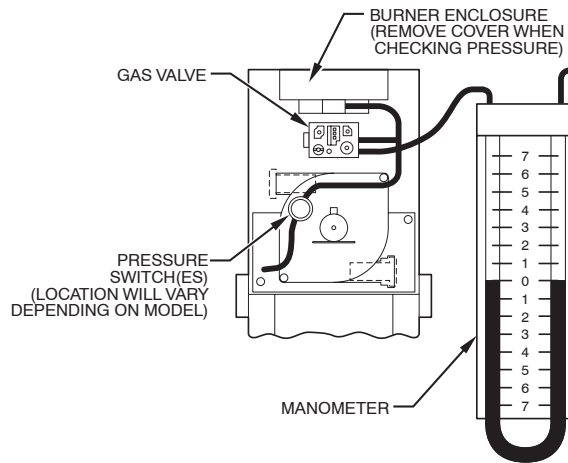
Adjusting Manifold Pressure (Manometer Attachment)
